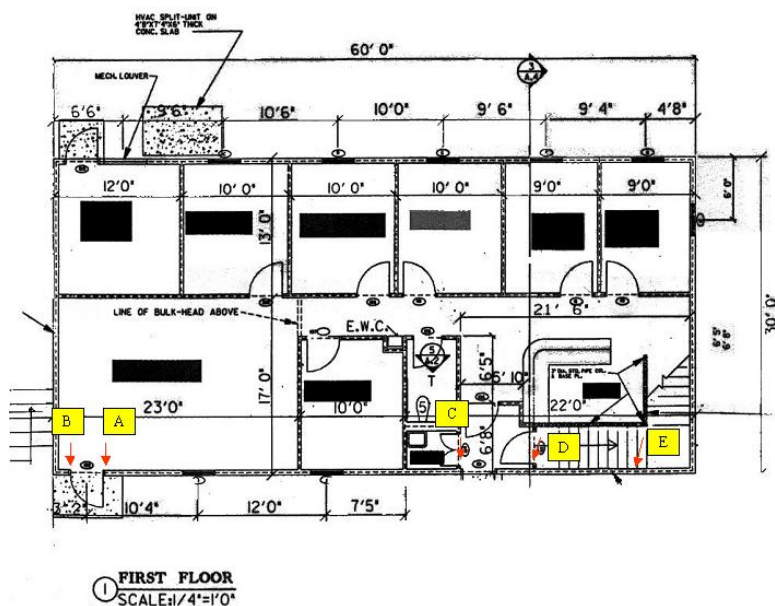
First Floor Plan – Excitation Locations A through E for Hammer Impacts
